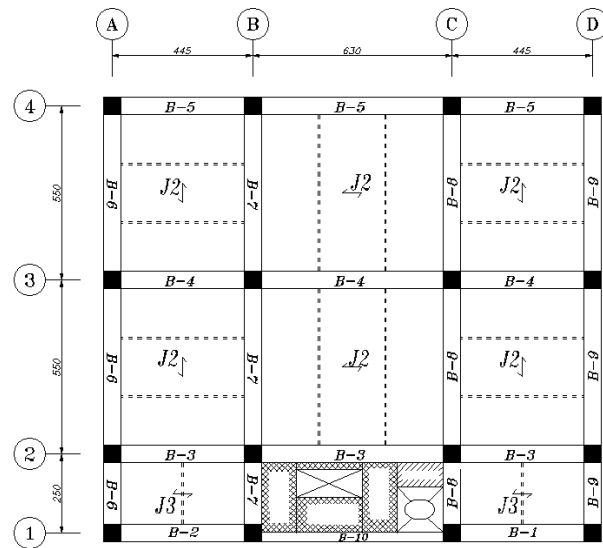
The plan to specify beam and floor type for elevation 2.80
